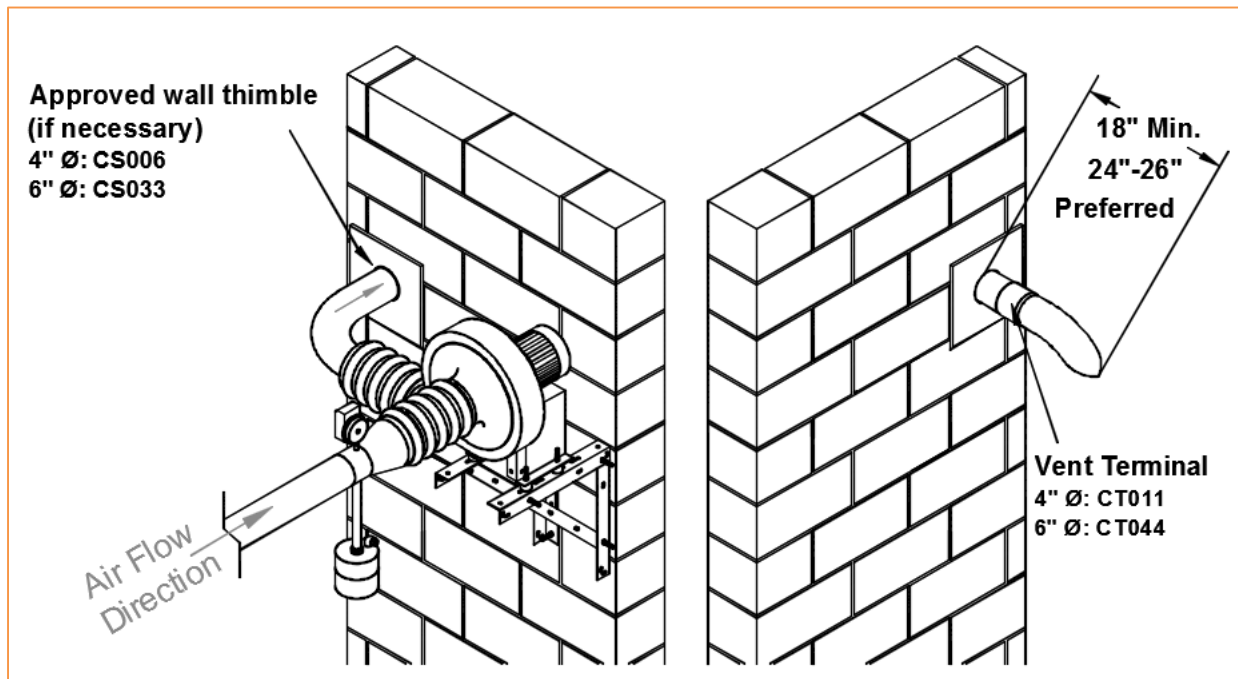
Side Wall Mounting - Recommended Venting (Horizontal)
